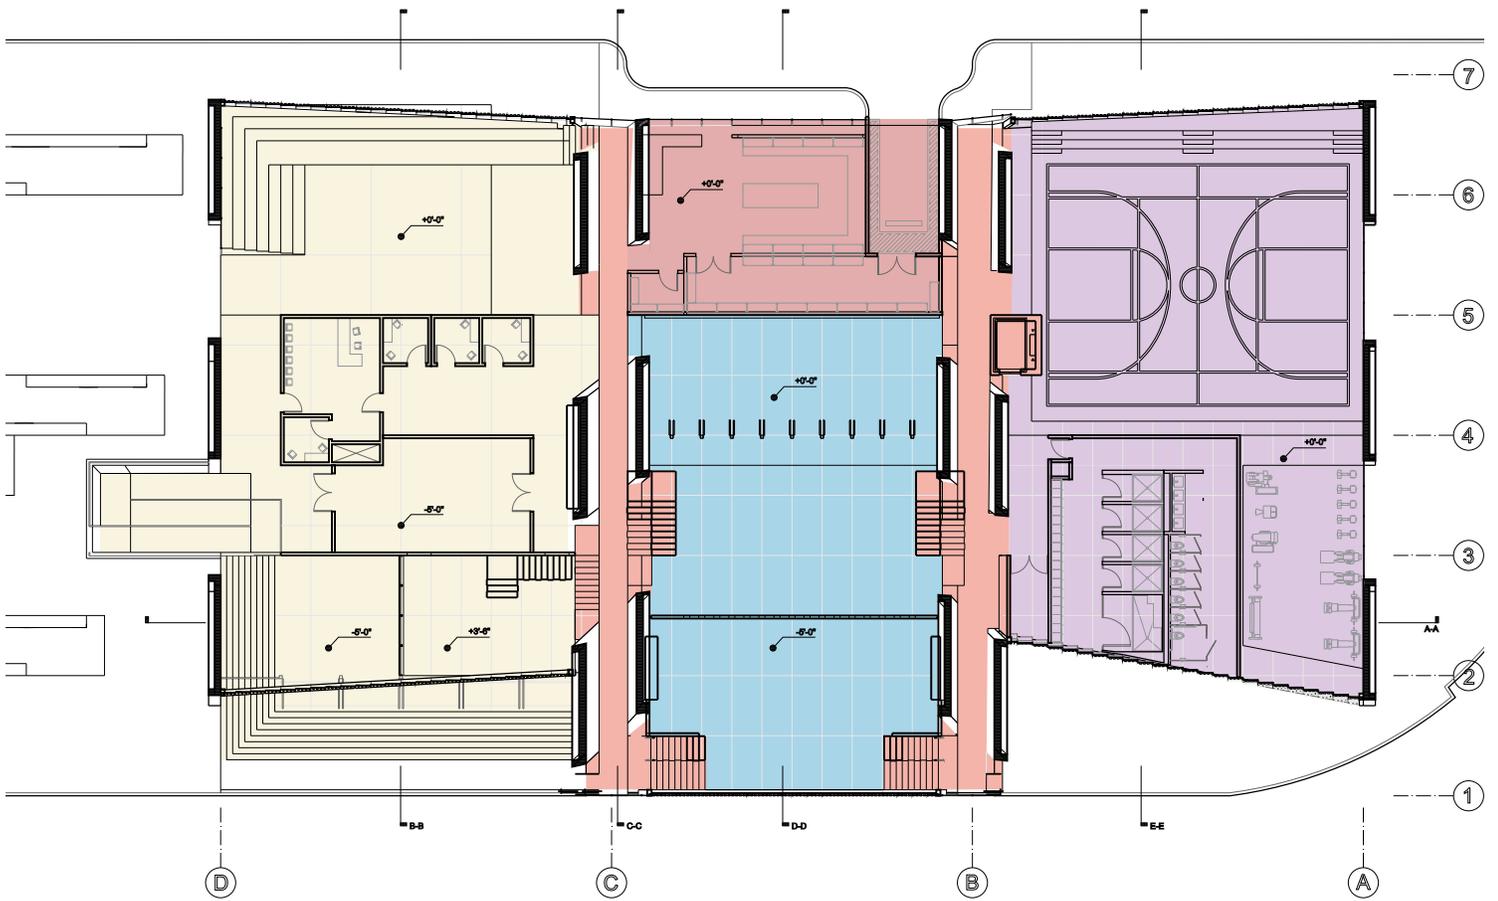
// Level 01 - Ground Floor Plan // By Ian
